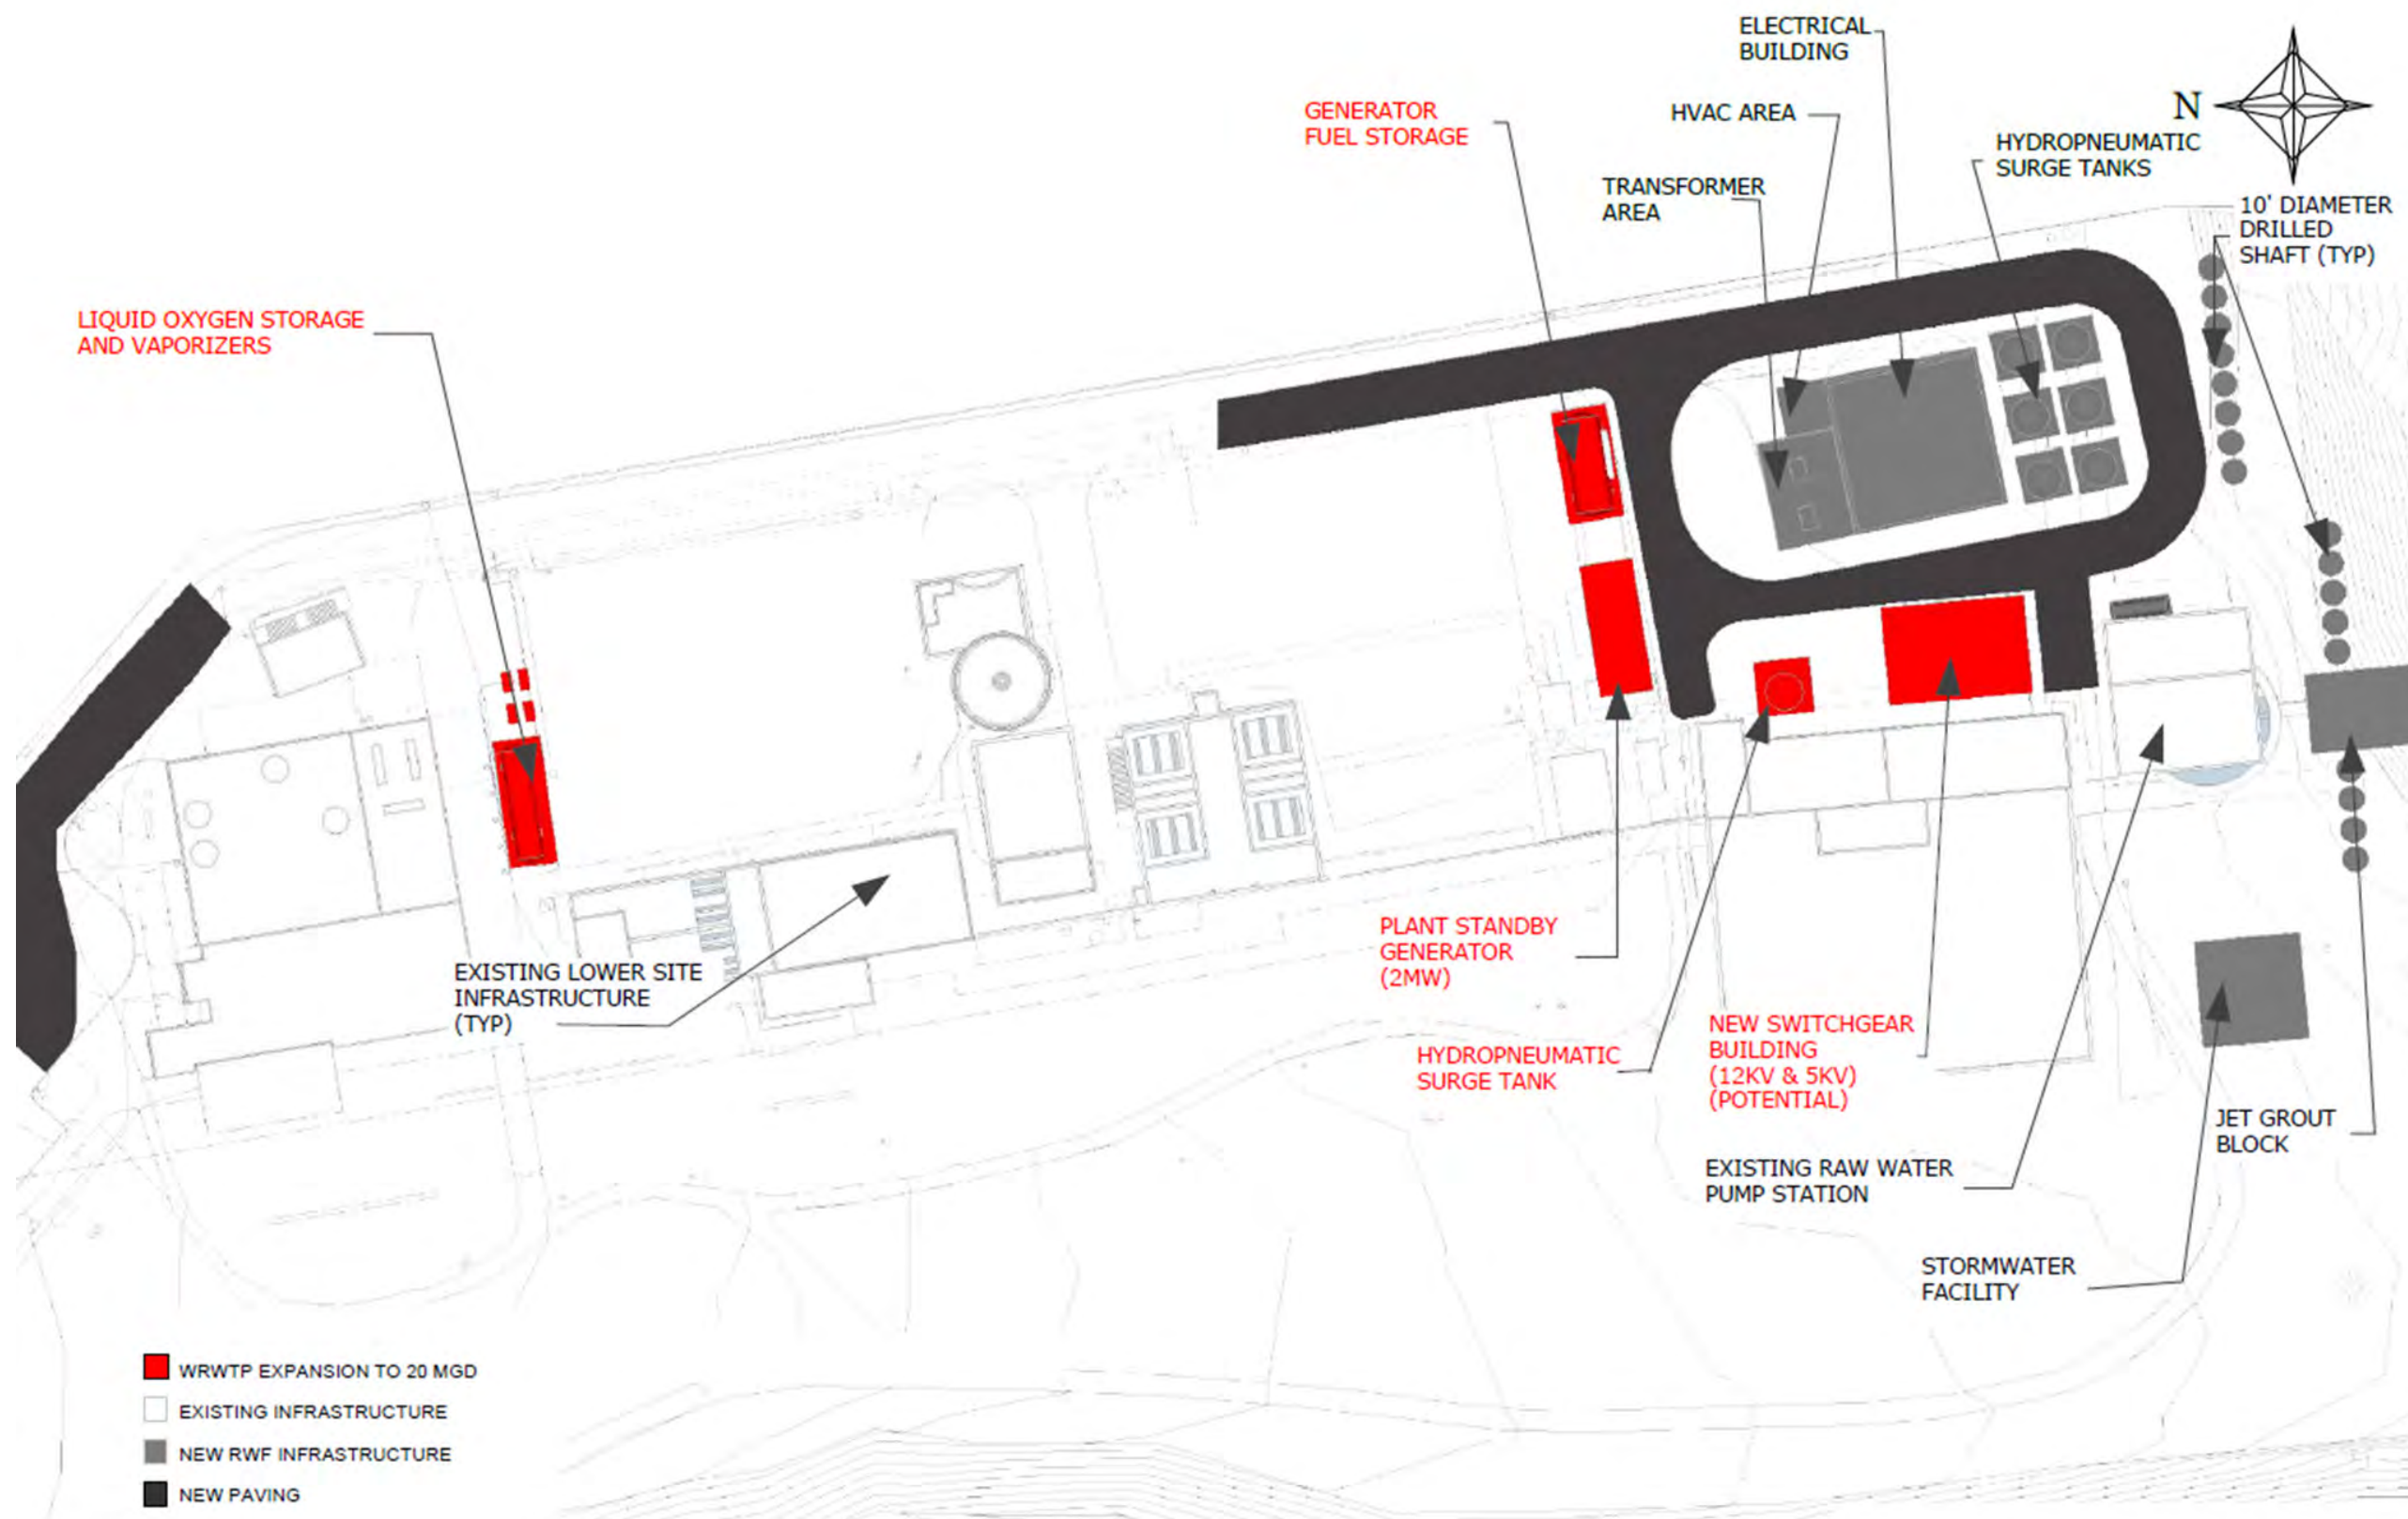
Site Plan – 20-MGD Capacity Expansion
